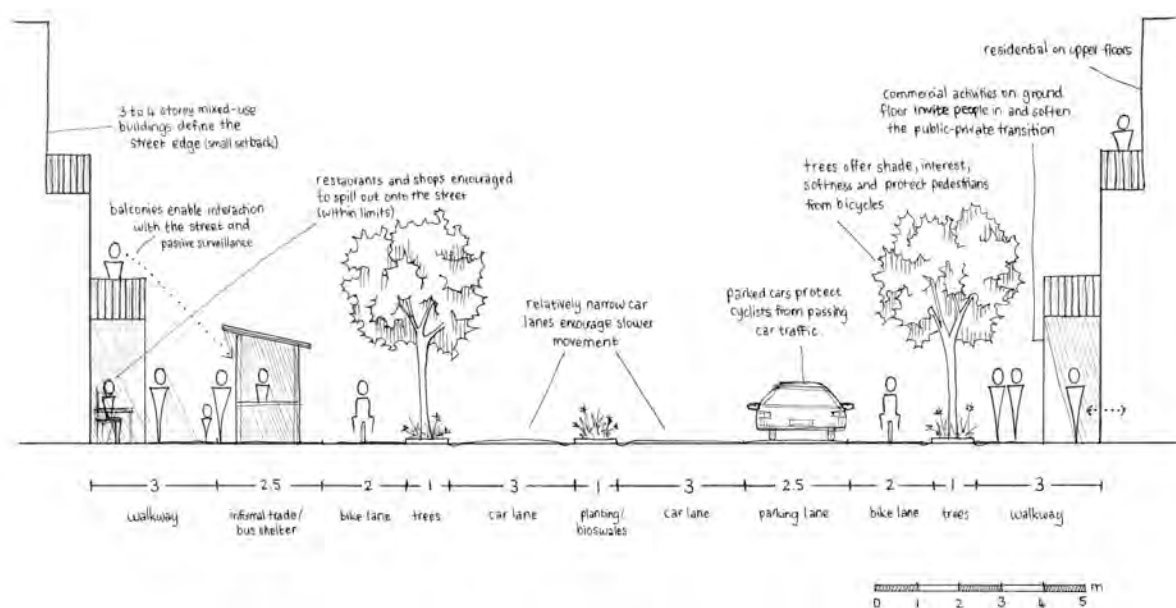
Indicative street section showing urban design principles (Source: Author)
